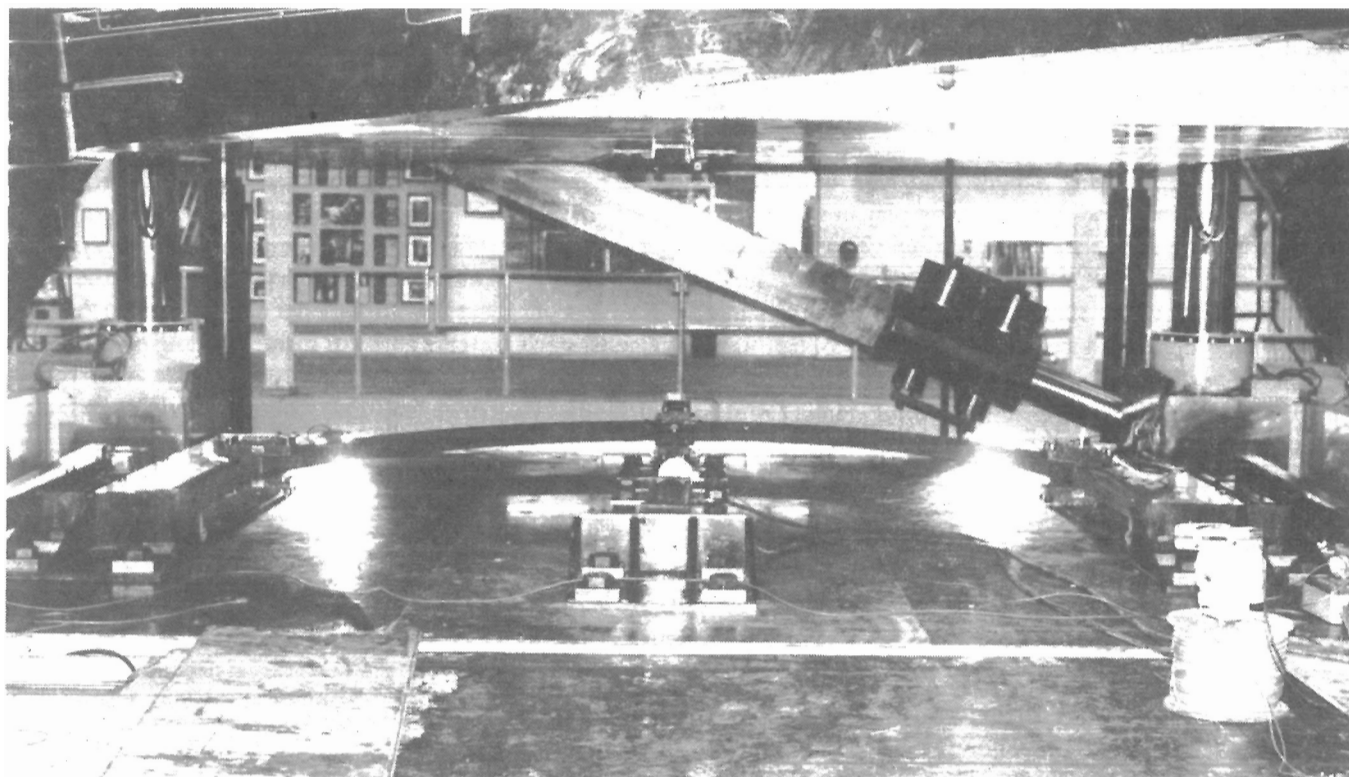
Steel-set arch static test installation in mine roof simulator (rollers at angles of 33° from crown not shown).
